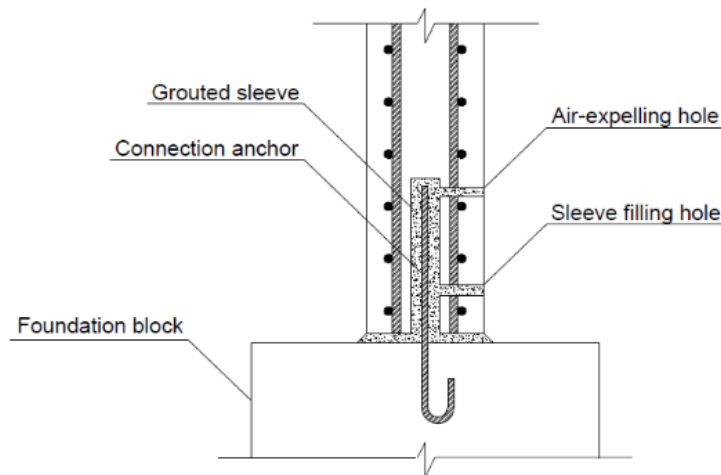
Wall-to-slab connection for reclaimed precast wall elements. (Volkov, 2019)
